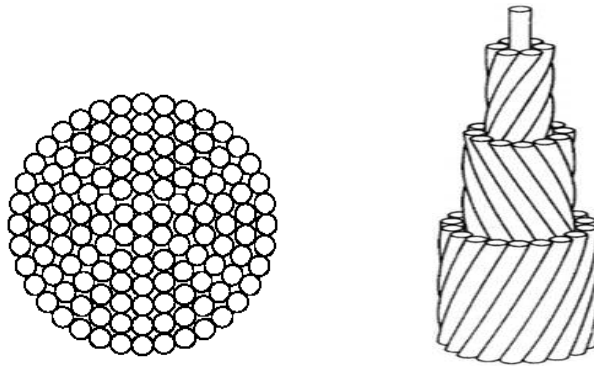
Cross-section and side elevation of a typical spiral-strand cable
